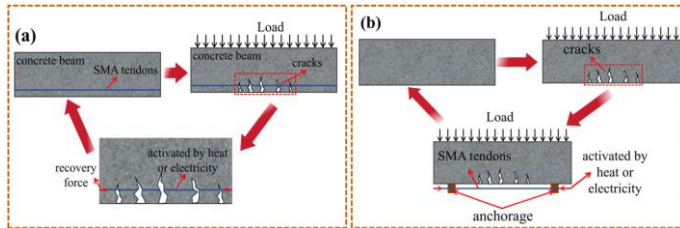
Methods for installing SMA in concrete beams that self-heal: (a) internal: tension reinforcement replacement; (b) external: fastening with anchors in the beam's tensile zone [73].
